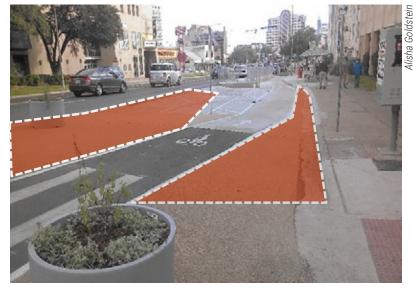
Adding a buffer, such as a stormwater planter, between modes of transportation can control stormwater and improve safety.
